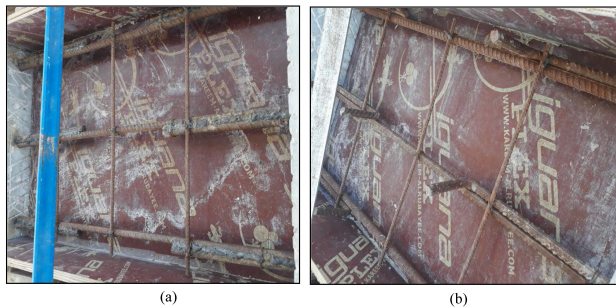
New to old steel bonding by: a) welding and b) making a hook with  $90^\circ$  angle.
